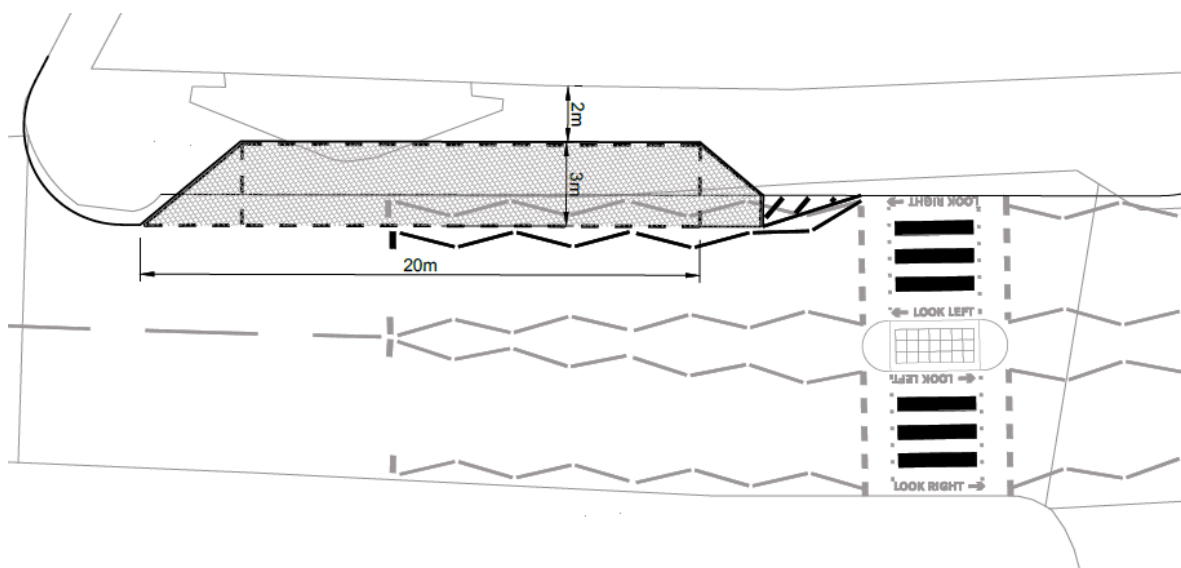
Proposed Highway Arrangement – Shaftesbury Avenue
